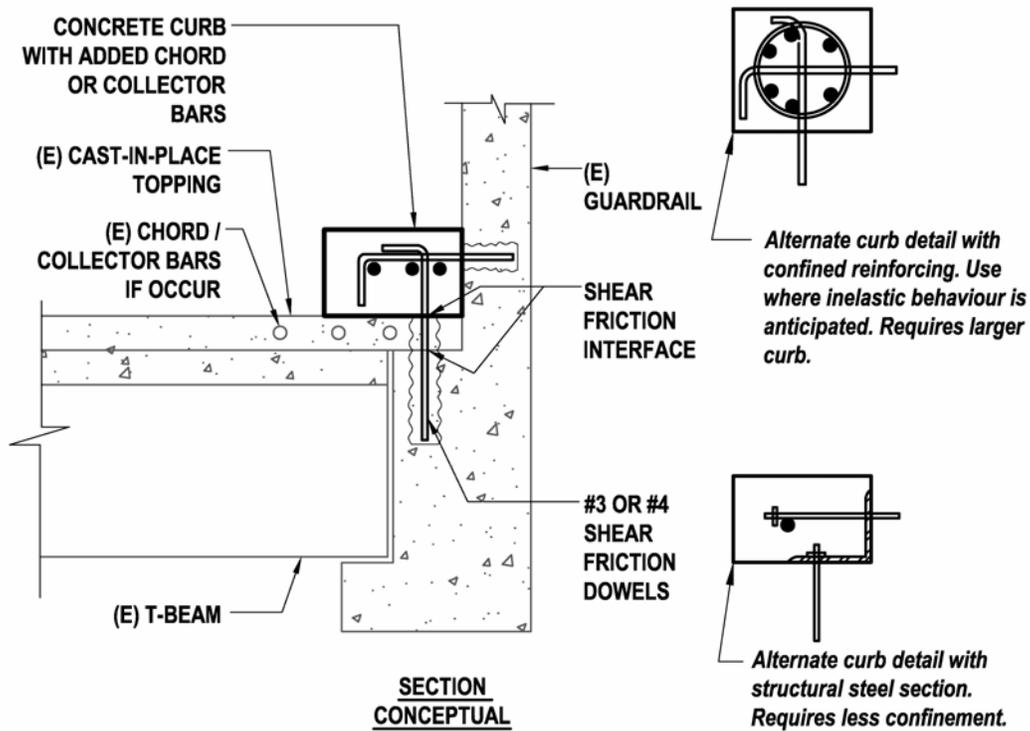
Added or Enhanced Chord or Collector at Floor Perimeter with Cast-In-Place Topping Slab
